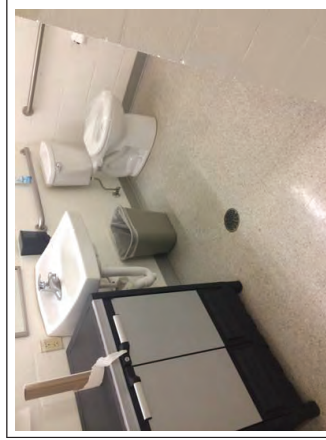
Interior view of concrete structure located on the north portion of the Subject Property.
